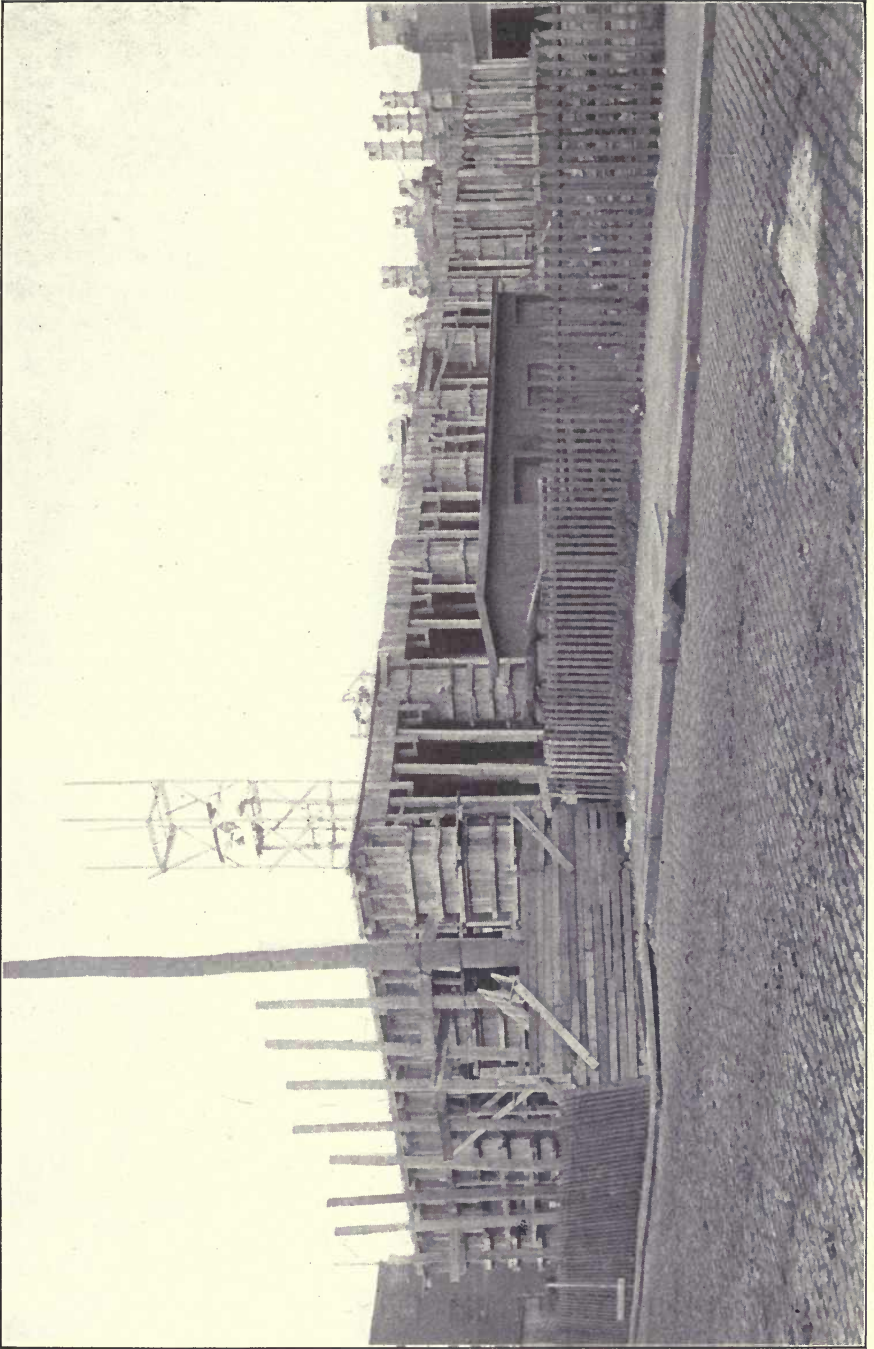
Lynn Storage Warehouse at Second Floor Level. (See p. 82.)
